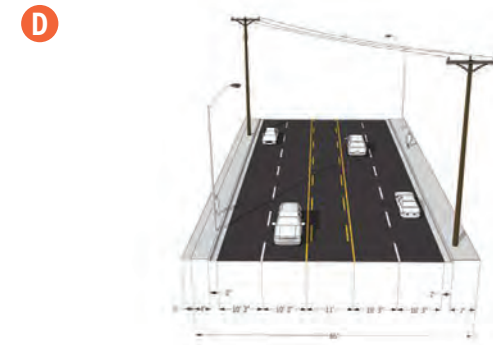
EXISTING 5-LANE CONFIGURATION WITH UNSAFE AND UNACCESSIBLE SIDEWALK CONDITIONS - 66' ROW
